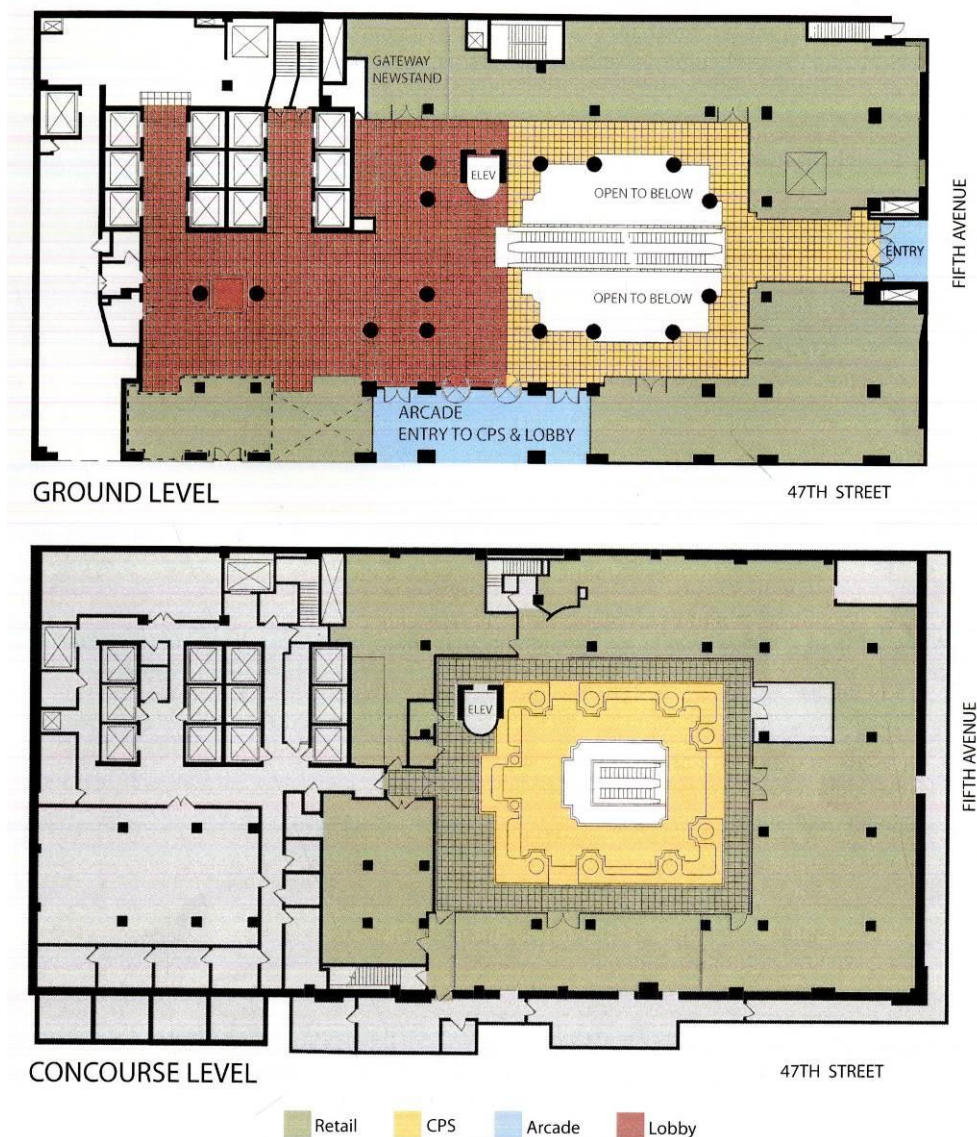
Floor Plans of 575 Fifth Avenue before Redesign
